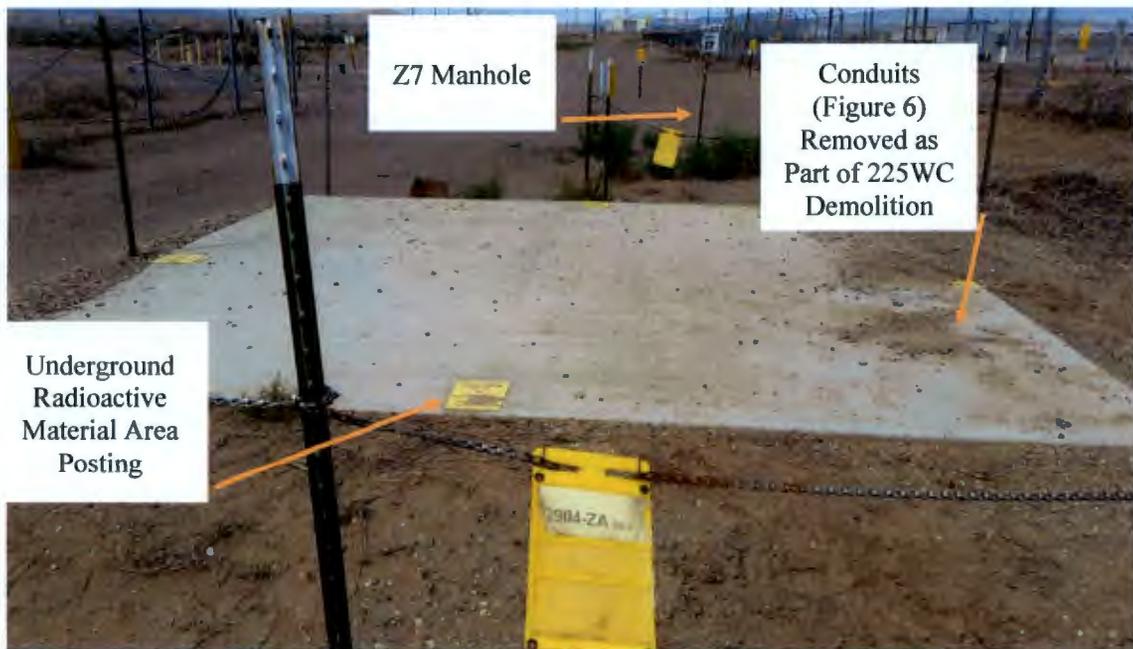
2904ZA Slab after Slab-on-Slab Installation and Conduit Removed
